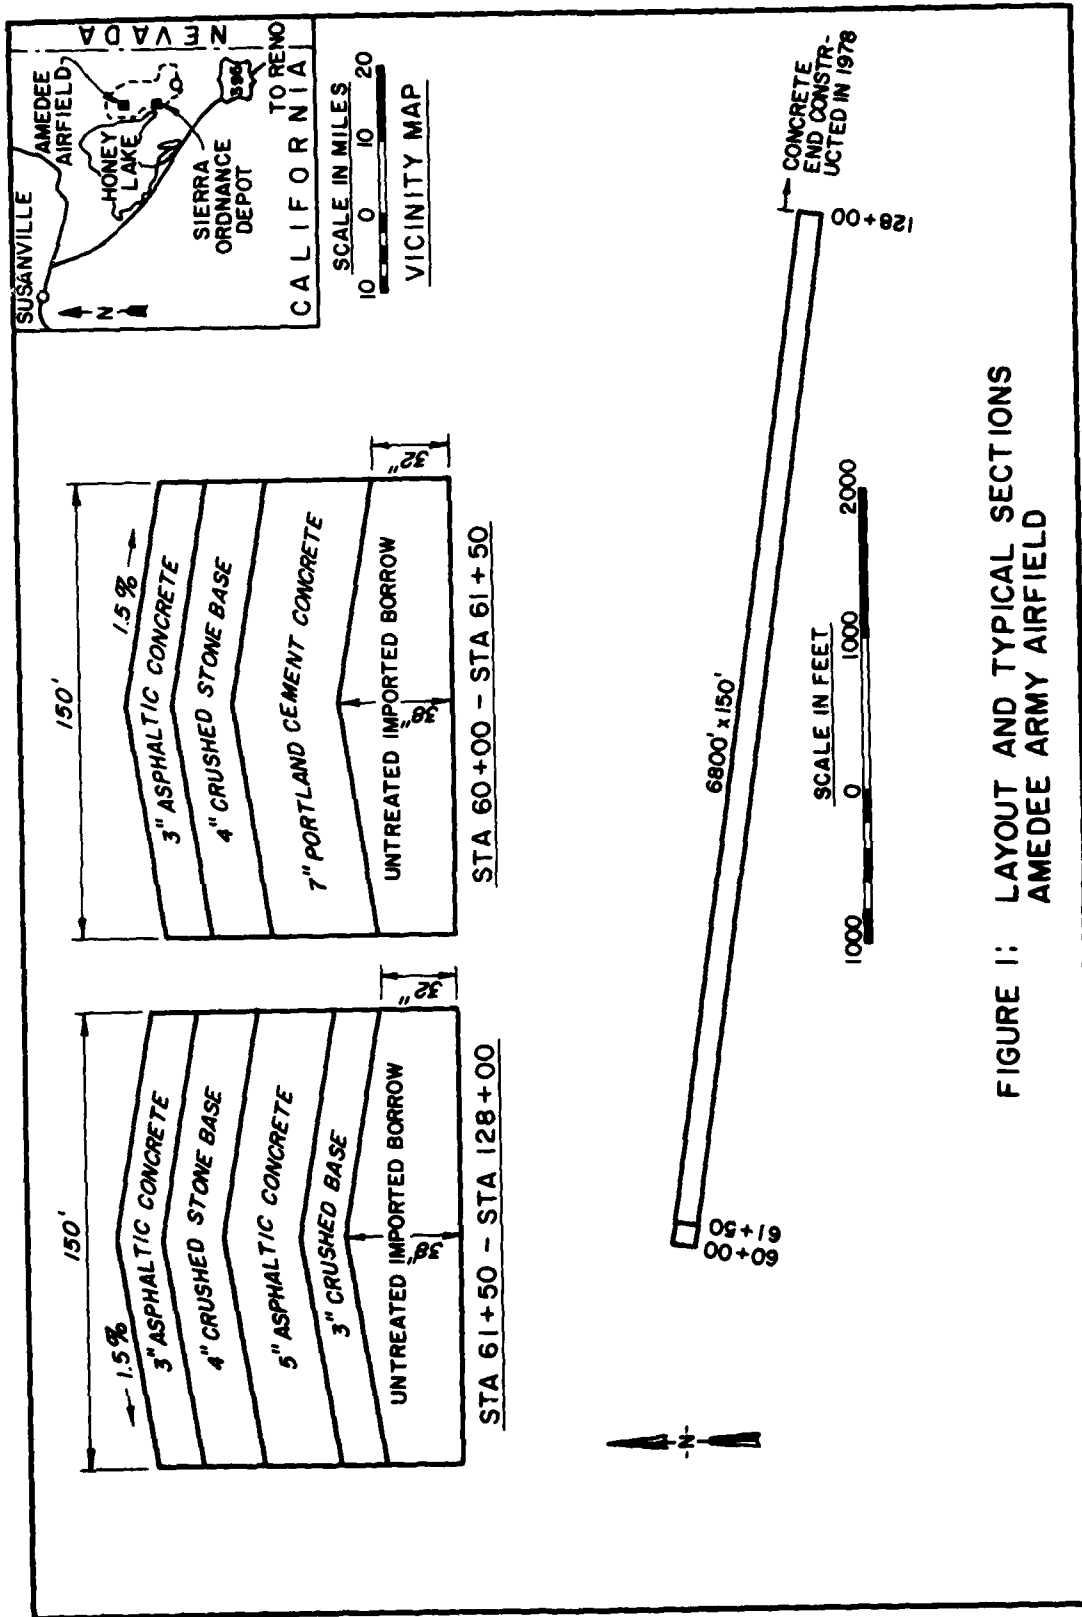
LAYOUT AND TYPICAL SECTIONS
